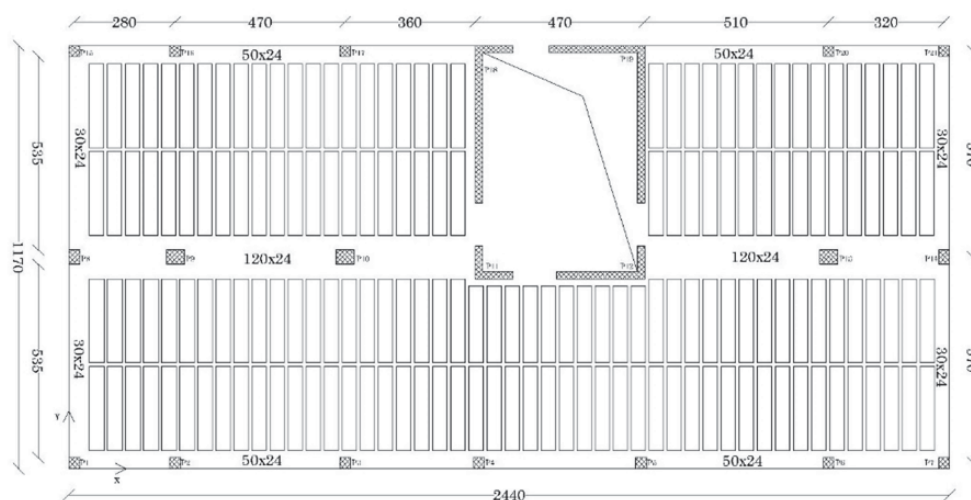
Typical floorplan of the examined case study building (dimensions in cm).
